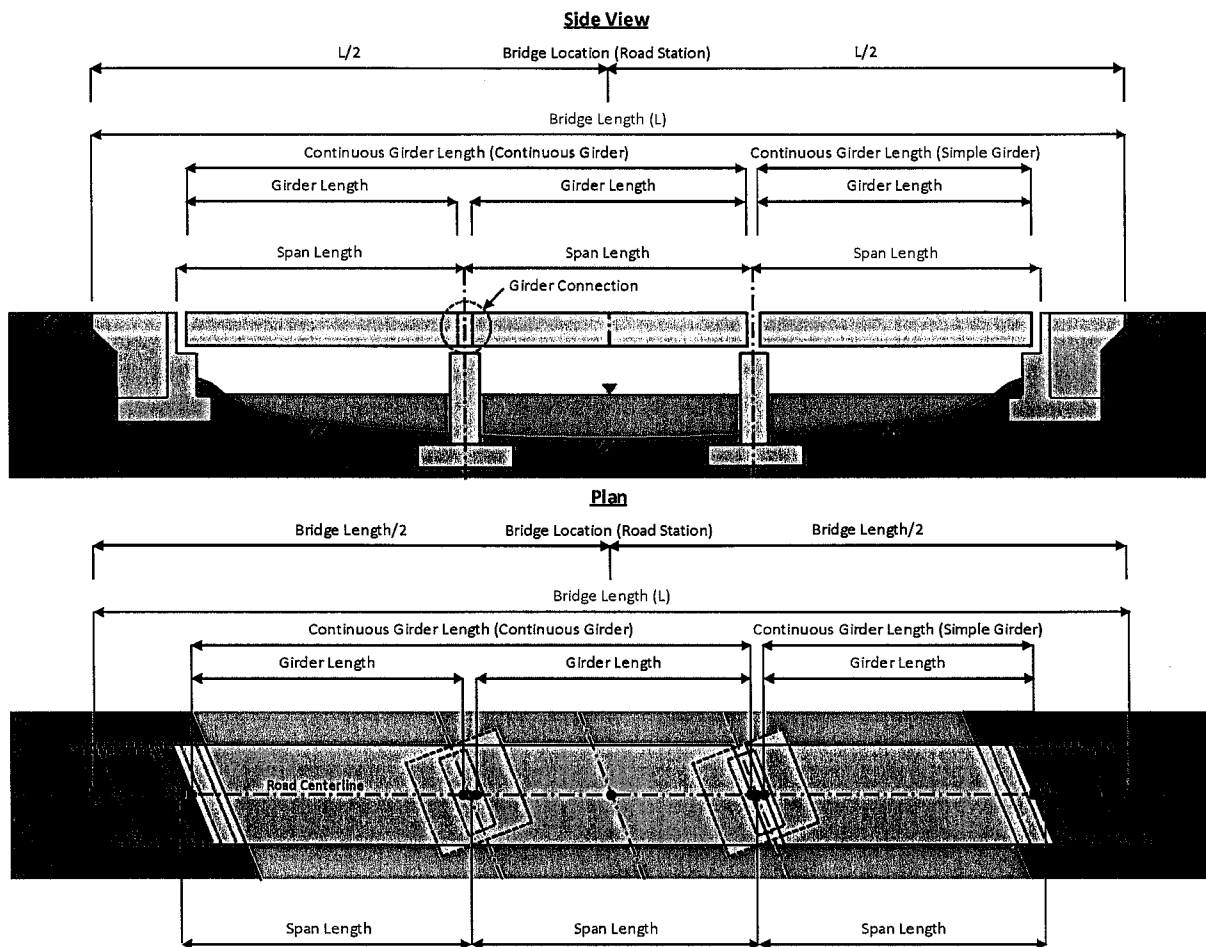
Definition of Bridge, Girder and Span Lengths
